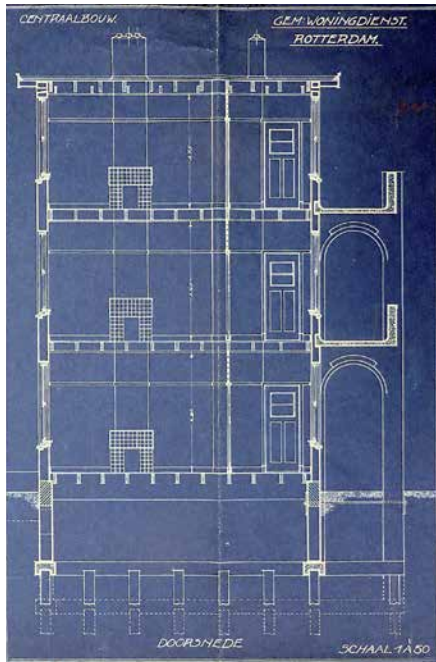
Cross-section through the 'Centraalbouw' prototype with concrete aerie gallery supported by masonry arches, designed by Plate's Gemeentelijke Woningdienst (SAR: BRN 1190 (6)).
